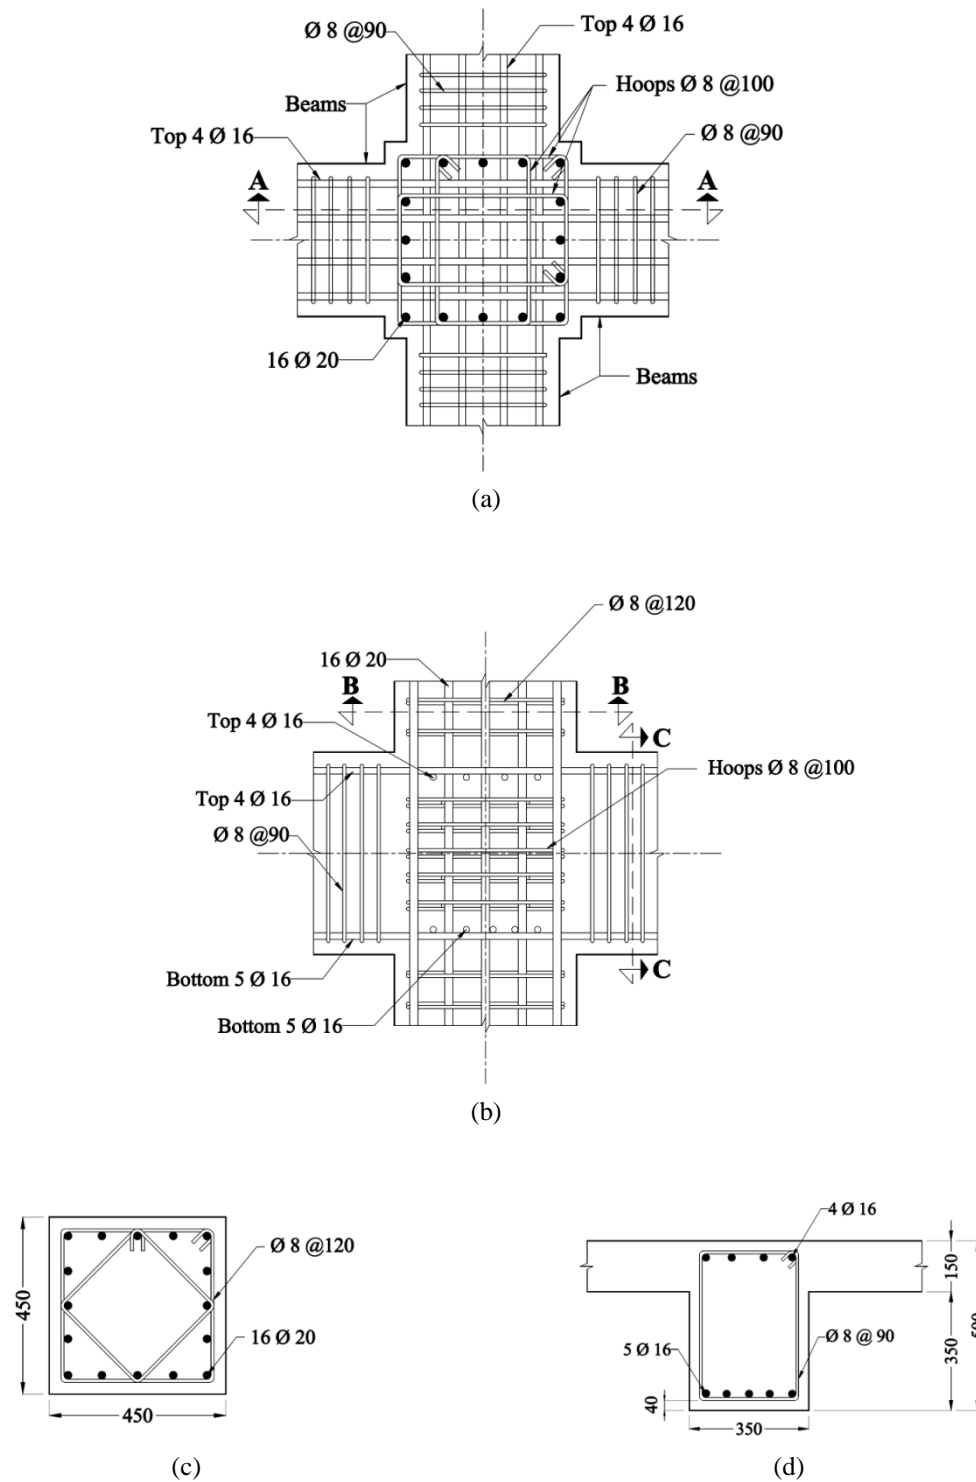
Cross-section details of the beam-column joint connection at the first floor of EC8 M5 building (a) top view, (b) elevation (section A-A) (c) section B-B in the column, and (d) section C-C in the beam (all dimensions are in millimetres).
